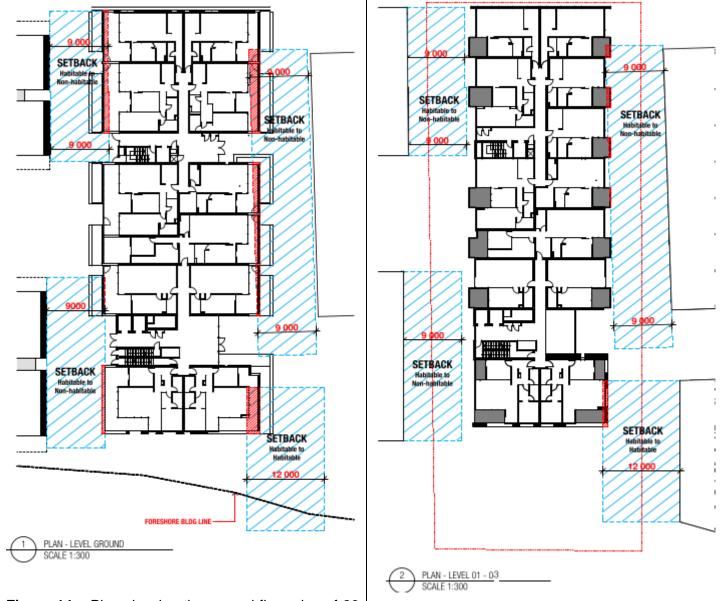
Plan showing the ground floor plan of 26 Shepherd St and the building separation distances from 20 and 28 Shepherd Street.
